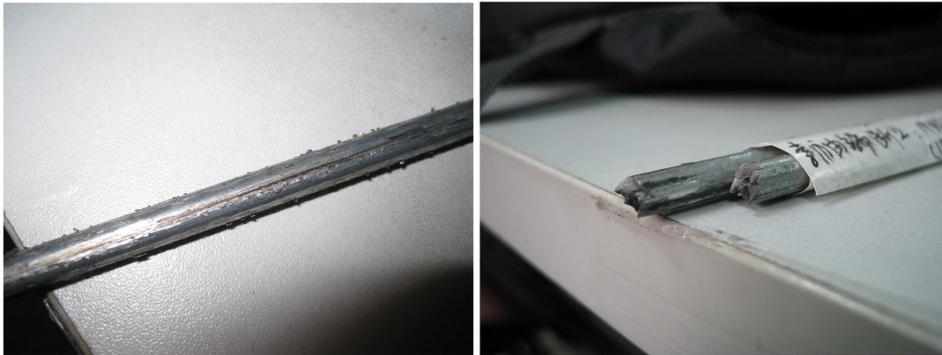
Wear and scratching on the surface of a steel wire acquired from a steel strand broken in a fatigue test.
